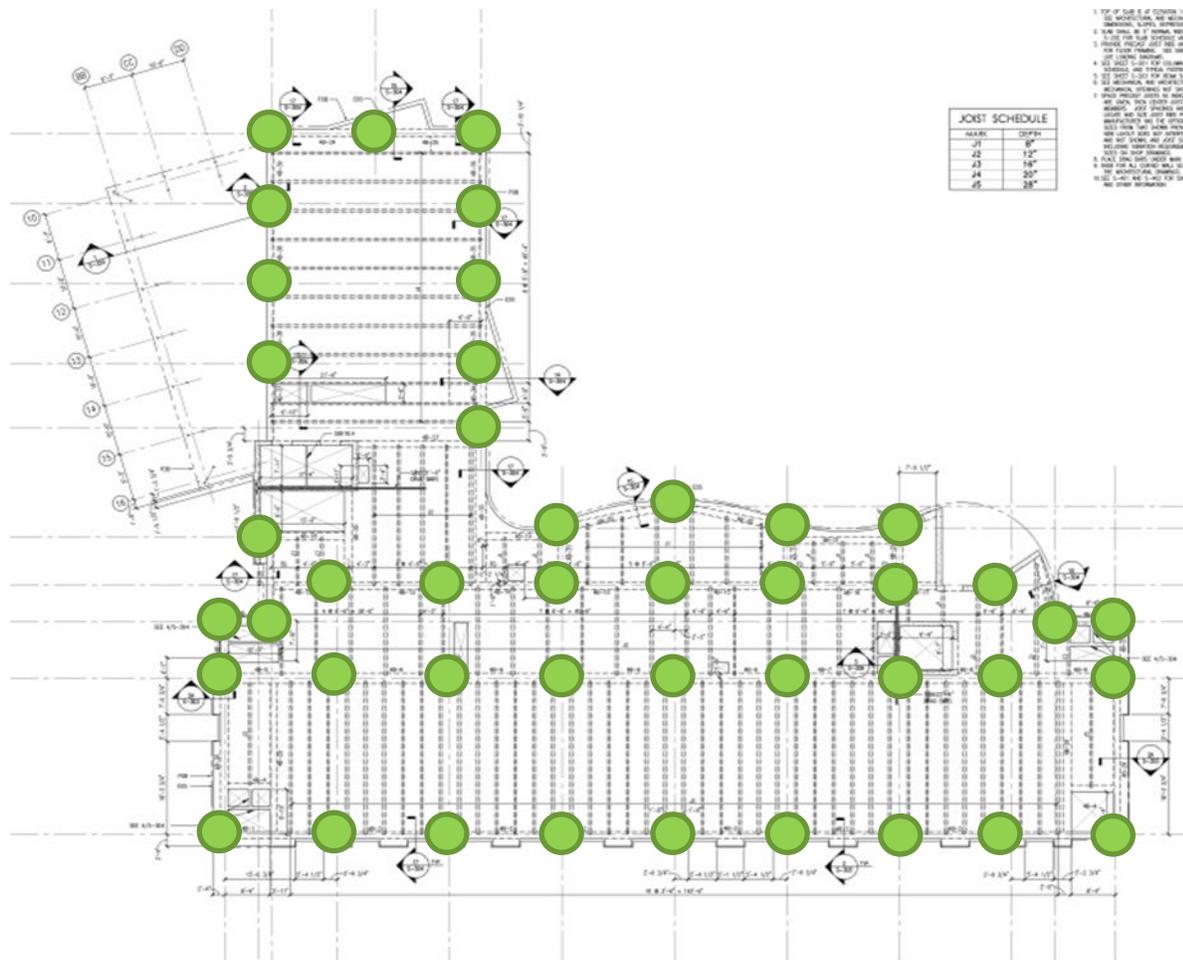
Plan showing the base isolator layout at the base of the first floor above the basement.
